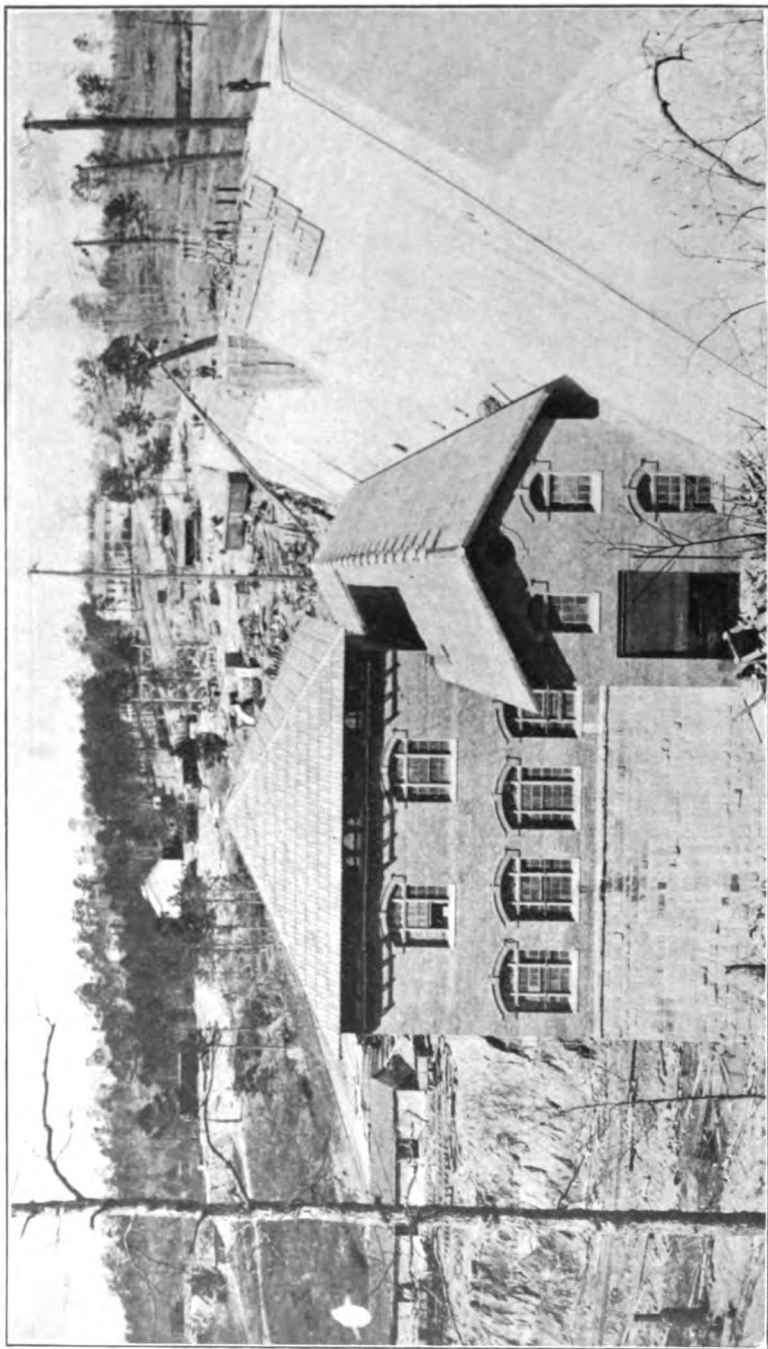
Outside view Great Falls station showing bulkhead wall and transformer house with line openings
